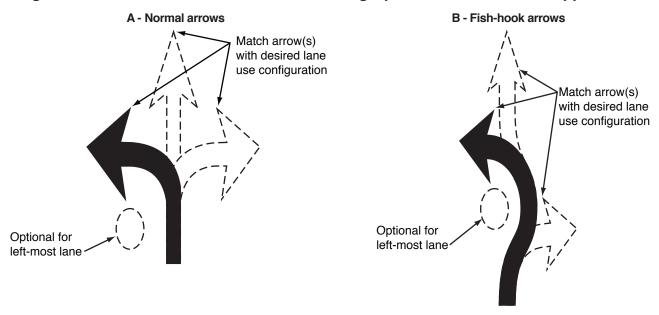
C-3. Lane-Use Arrow Pavement Marking Options for Roundabout Approaches
